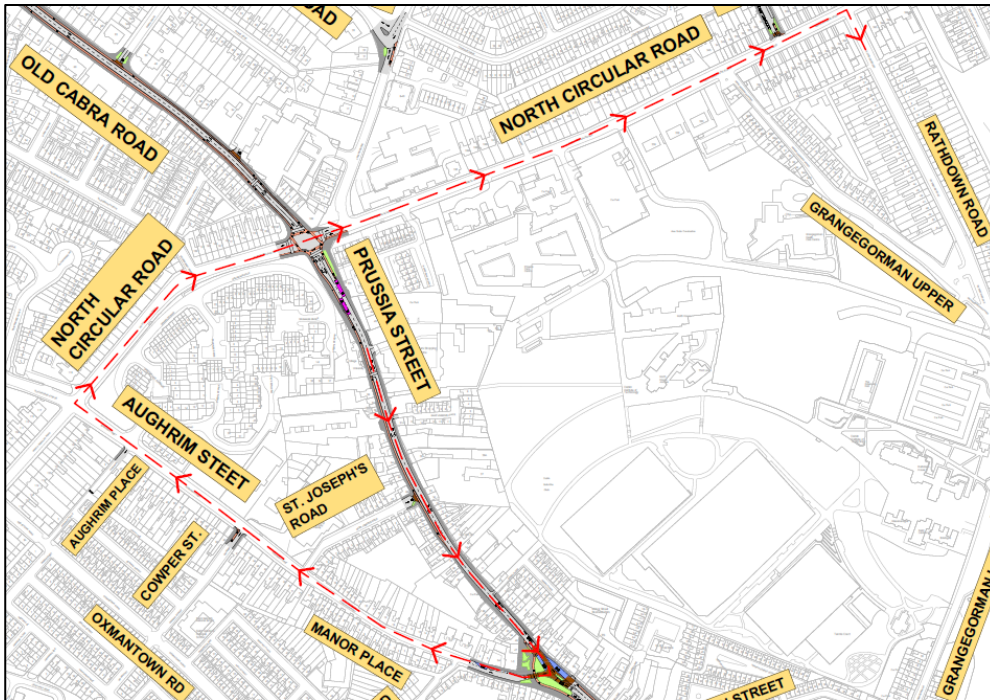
Possible access route from Prussia Street to Rathdown Road
